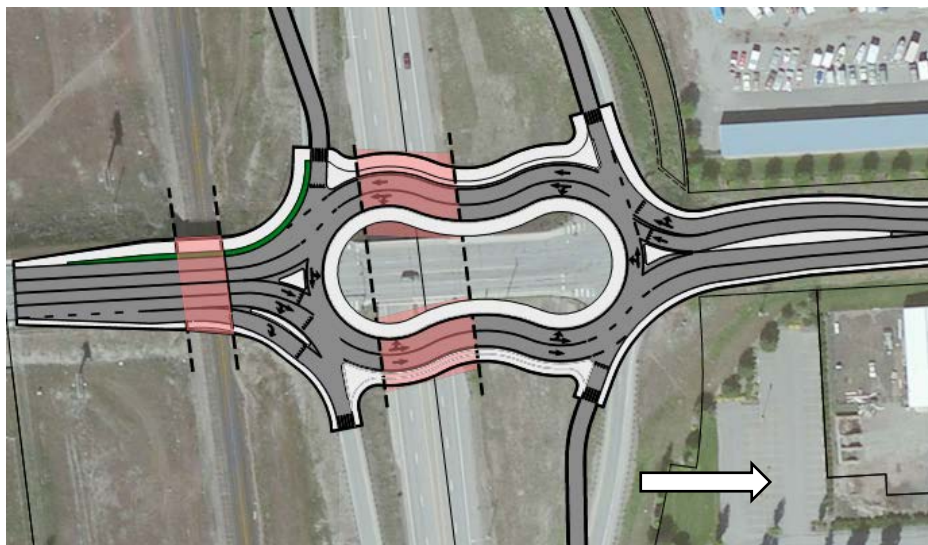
Sullivan Road – Trent to Just North of Upland Widening Overview
